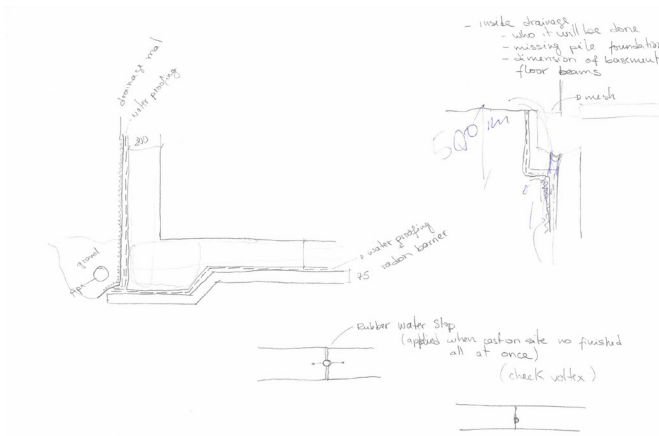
Sketch: basement floor and wall, with the impermeabilization
